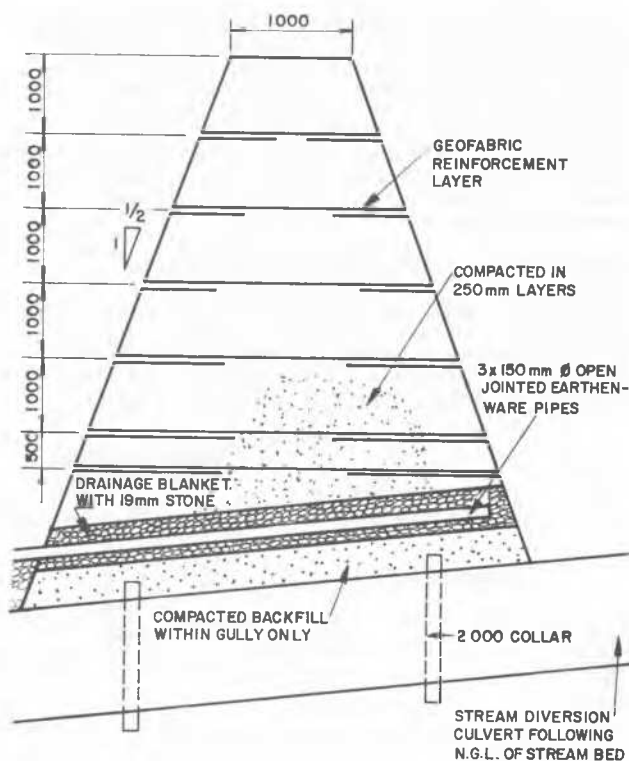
Section through geofabric-reinforced gravity section dam.
